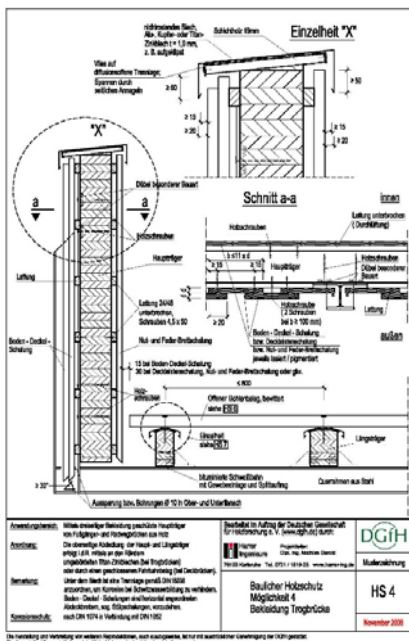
Sample drawing for structural timber Fig. 7 Detail drawing for handrail [6] protection [7]
